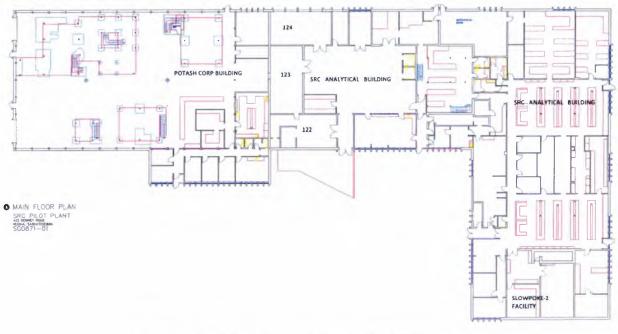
Floor Plan -- Potash Corp and SRC Analytical Source: SRC
